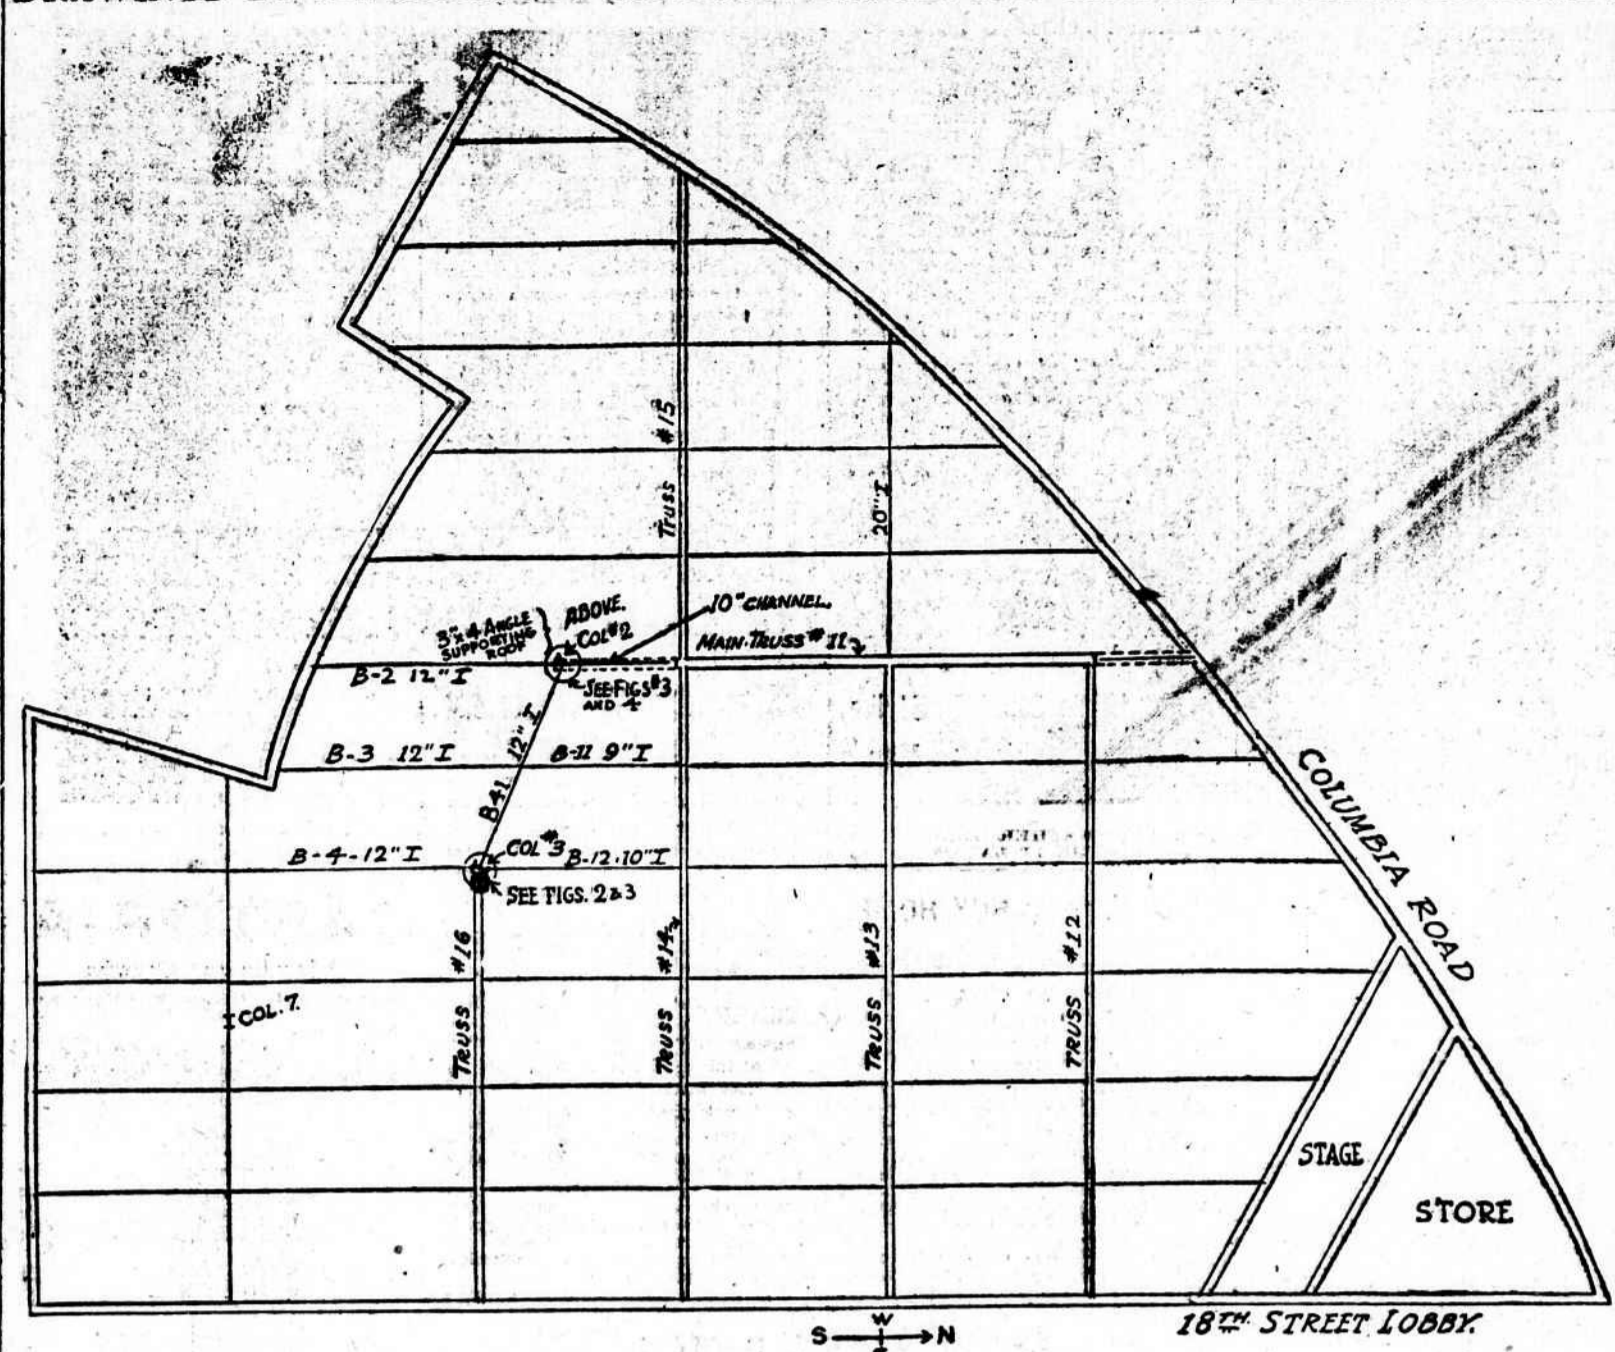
ROOF PLAN - KNICKERBOCKER THEATER.
